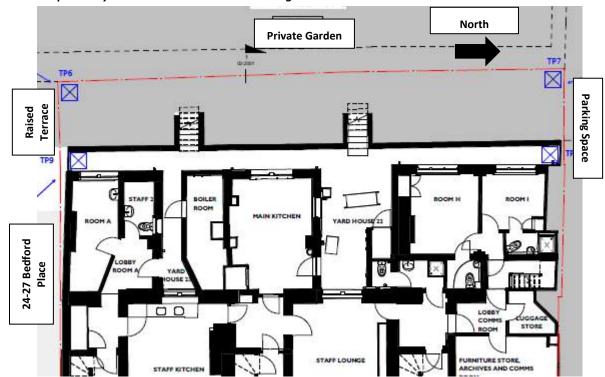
Exploratory Hole Location Plan – Trial Pitting Phase 2
